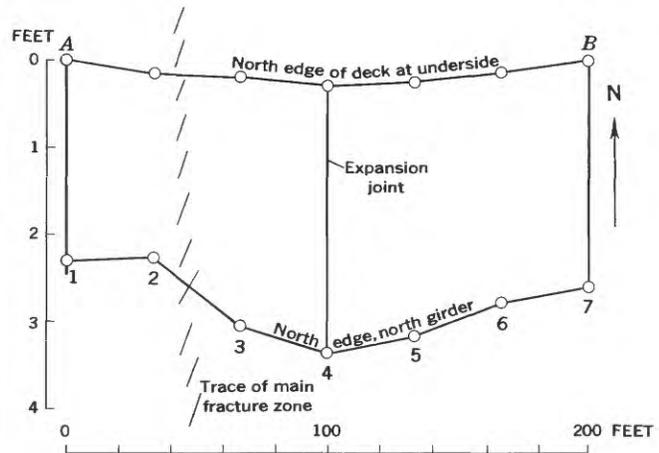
Deformation of Monterey County road bridge (No. 438) over Little Cholame Creek just south of Parkfield. Configuration of north edge of concrete deck as measured at underside, and configuration of northernmost of three steel I-beam girders that support deck. Configurations based on measurements made by E. F. Roth in July and August 1966, at points opposite each of seven steel piers (numbered from west to east) that support the girder, with reference to a string that was tightly stretched between points A and B at lower edge of deck. Note great exaggeration ($33\frac{1}{2}\times$) of north-south scale.
